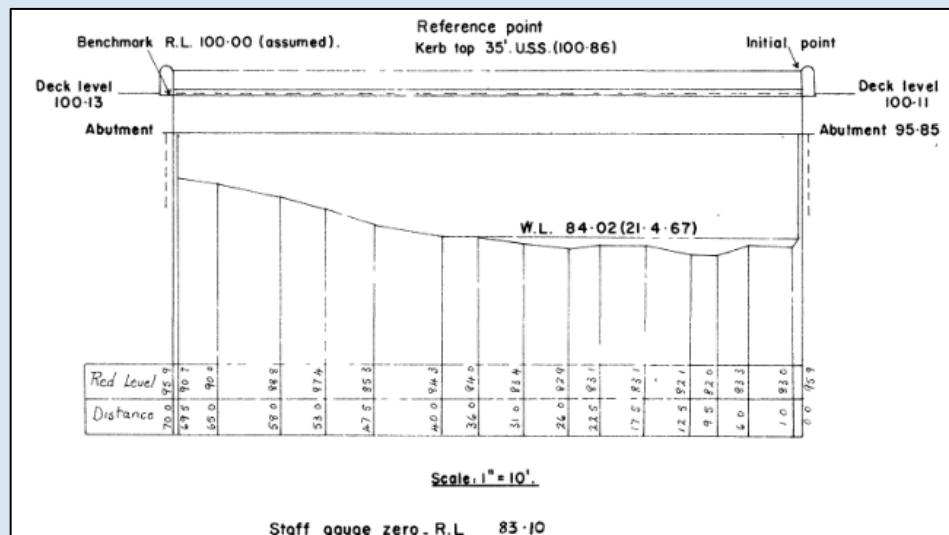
HRC Drawing 1575-2 Milson Line Bridge.
